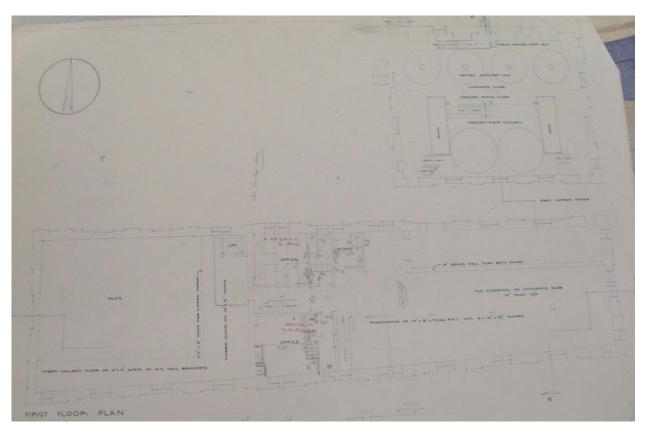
Plan drawings showing windows of Irving Street Brewery buildings: First floor plan by Lemont Niblett and Daubney, Drawing No. 4E-852A dated 27-07-54
